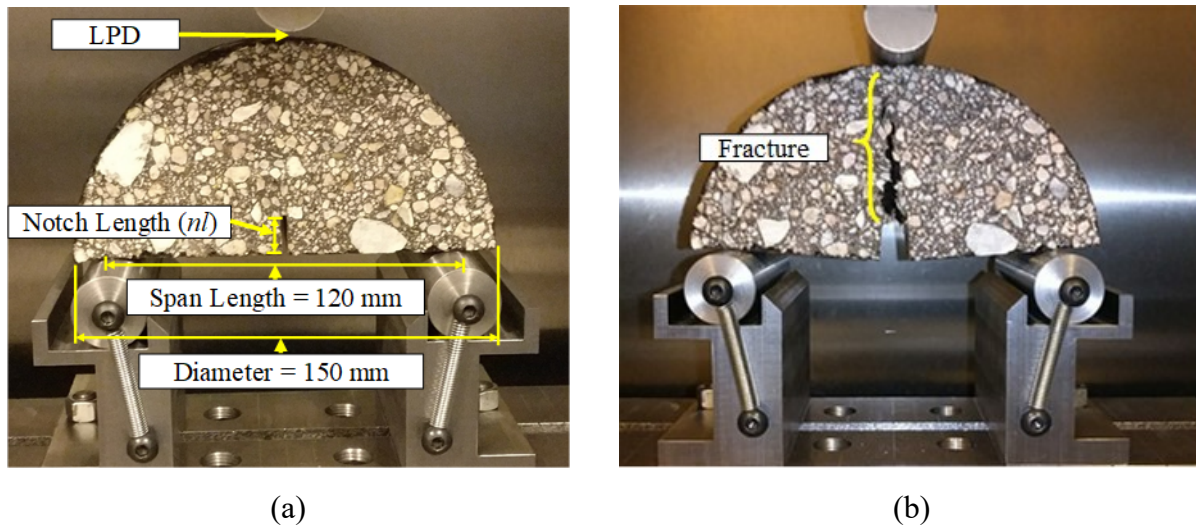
SCB fracture test: (a) test set-up and (b) fracture after SCB testing.
